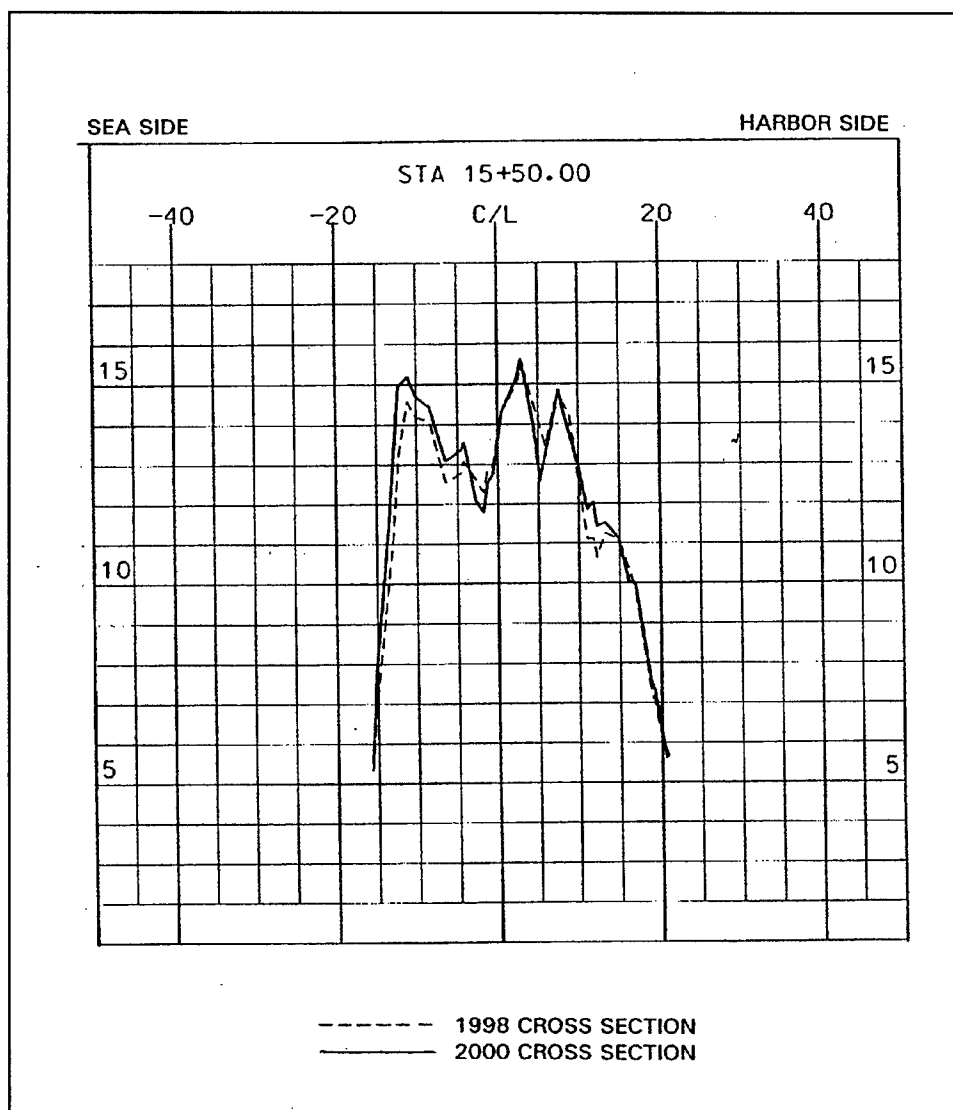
Cross sections of Morro Bay outer south breakwater, sta 15+50
